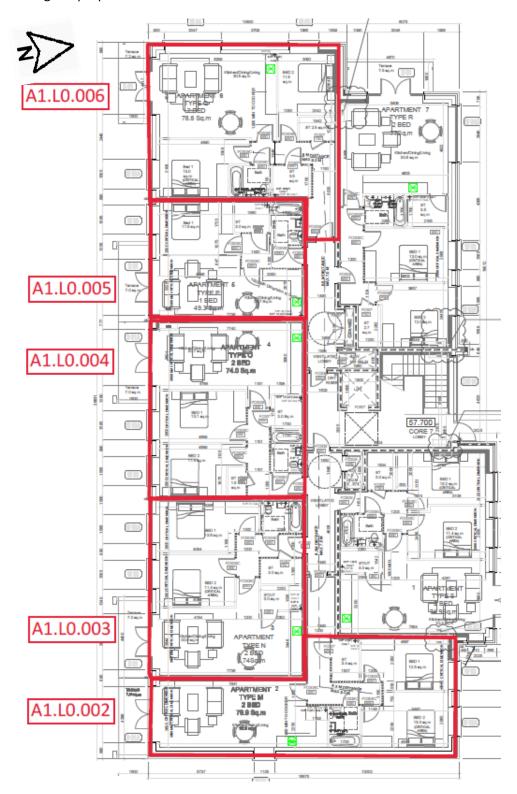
Floor Layout of the Existing Block A1 (Pappan Grove) – Ground Floor
